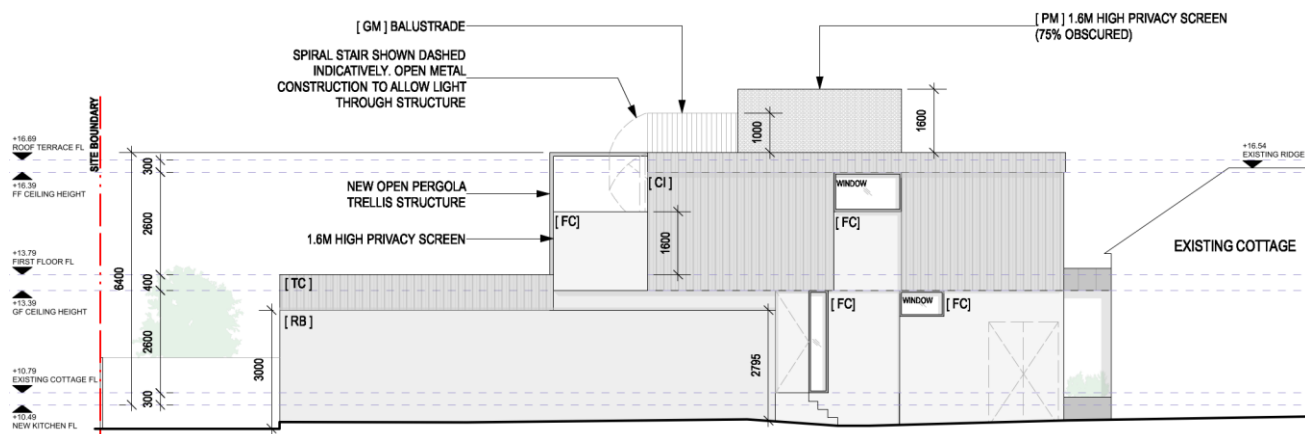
Previous First Floor Addition Design – Drawings dated 11 April 2023, showing extent of wall length and building bulk.
